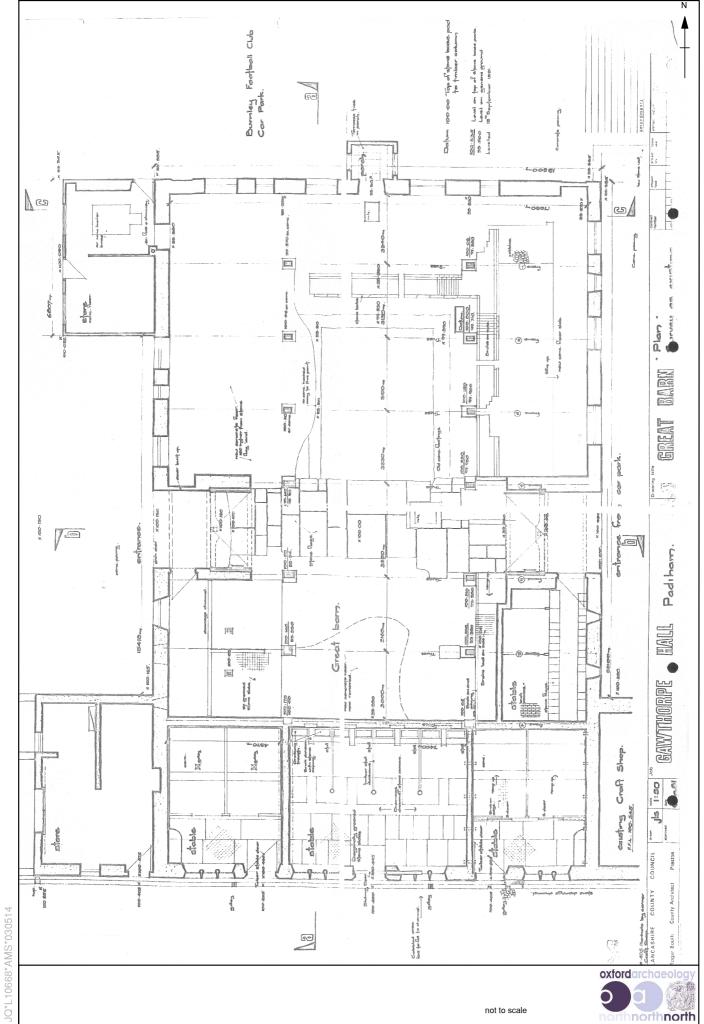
Gawthorpe Hall Ground Floor plan, 1981 (LCC)
